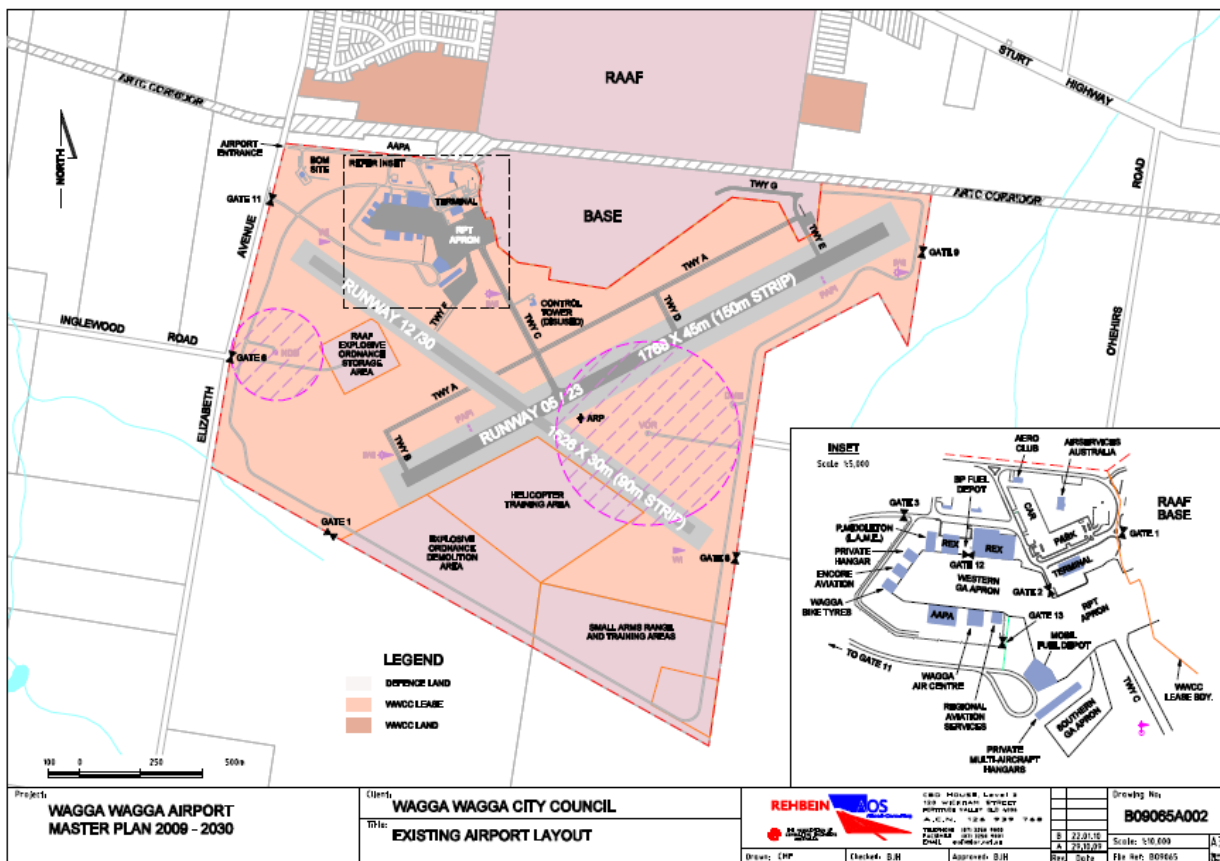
Extract from Airport Masterplan 2010- existing runway layout
